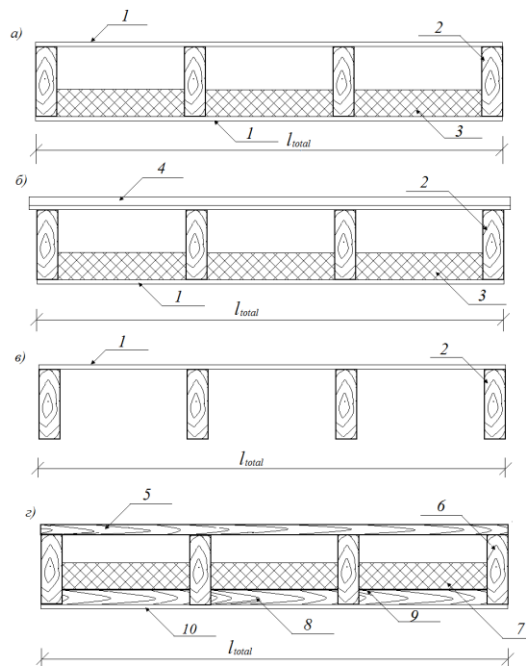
Types of light roofing slabs: a) - cross-section slab with thermal insulation box for roll roofing; b) - a plate for roofing with corrugated sheet metal or asbestos-cement, the lower part of which is covered with plywood; c) - a plate
